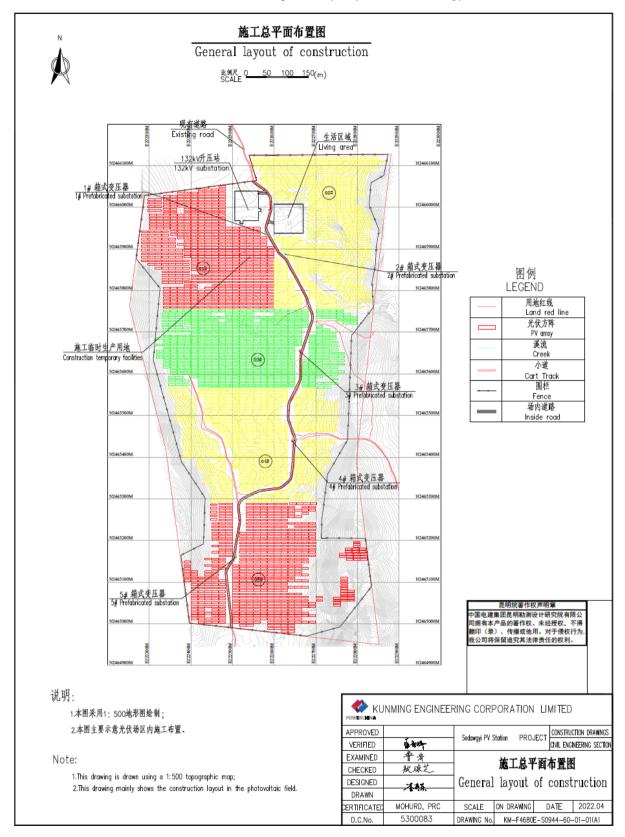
General Layout of Sedawgyi Solar Power Station
